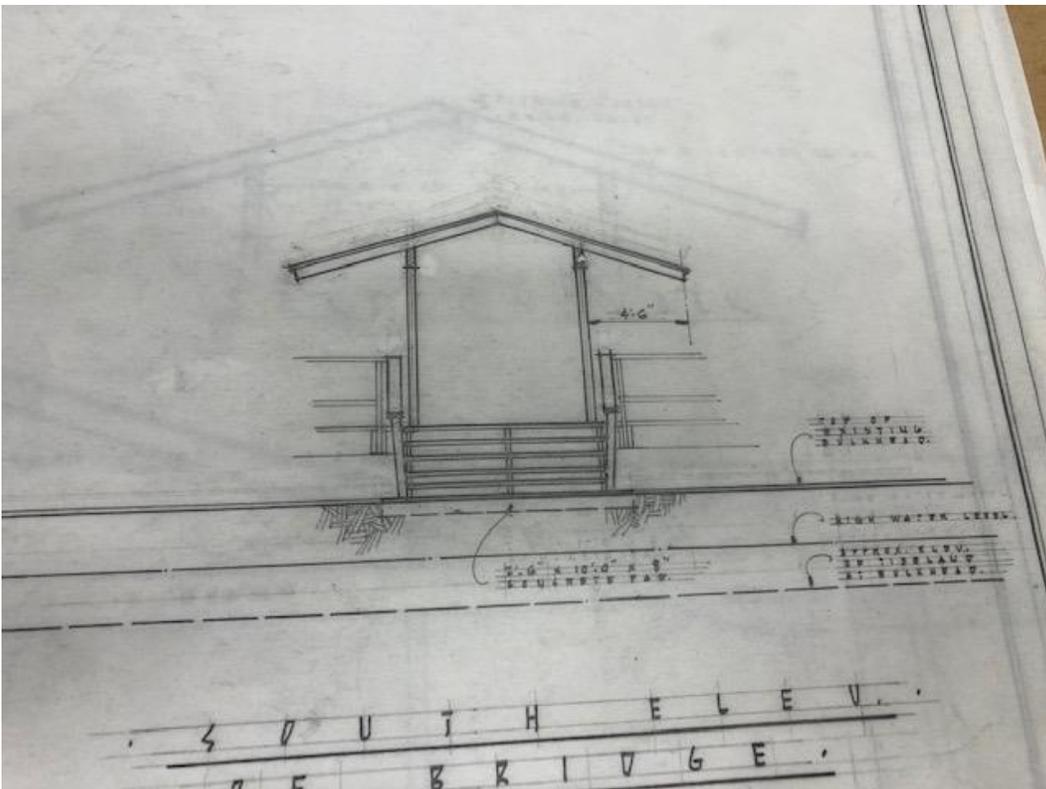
Photograph of the original 1960 architect's drawings for KGY Studio's entry bridge.
